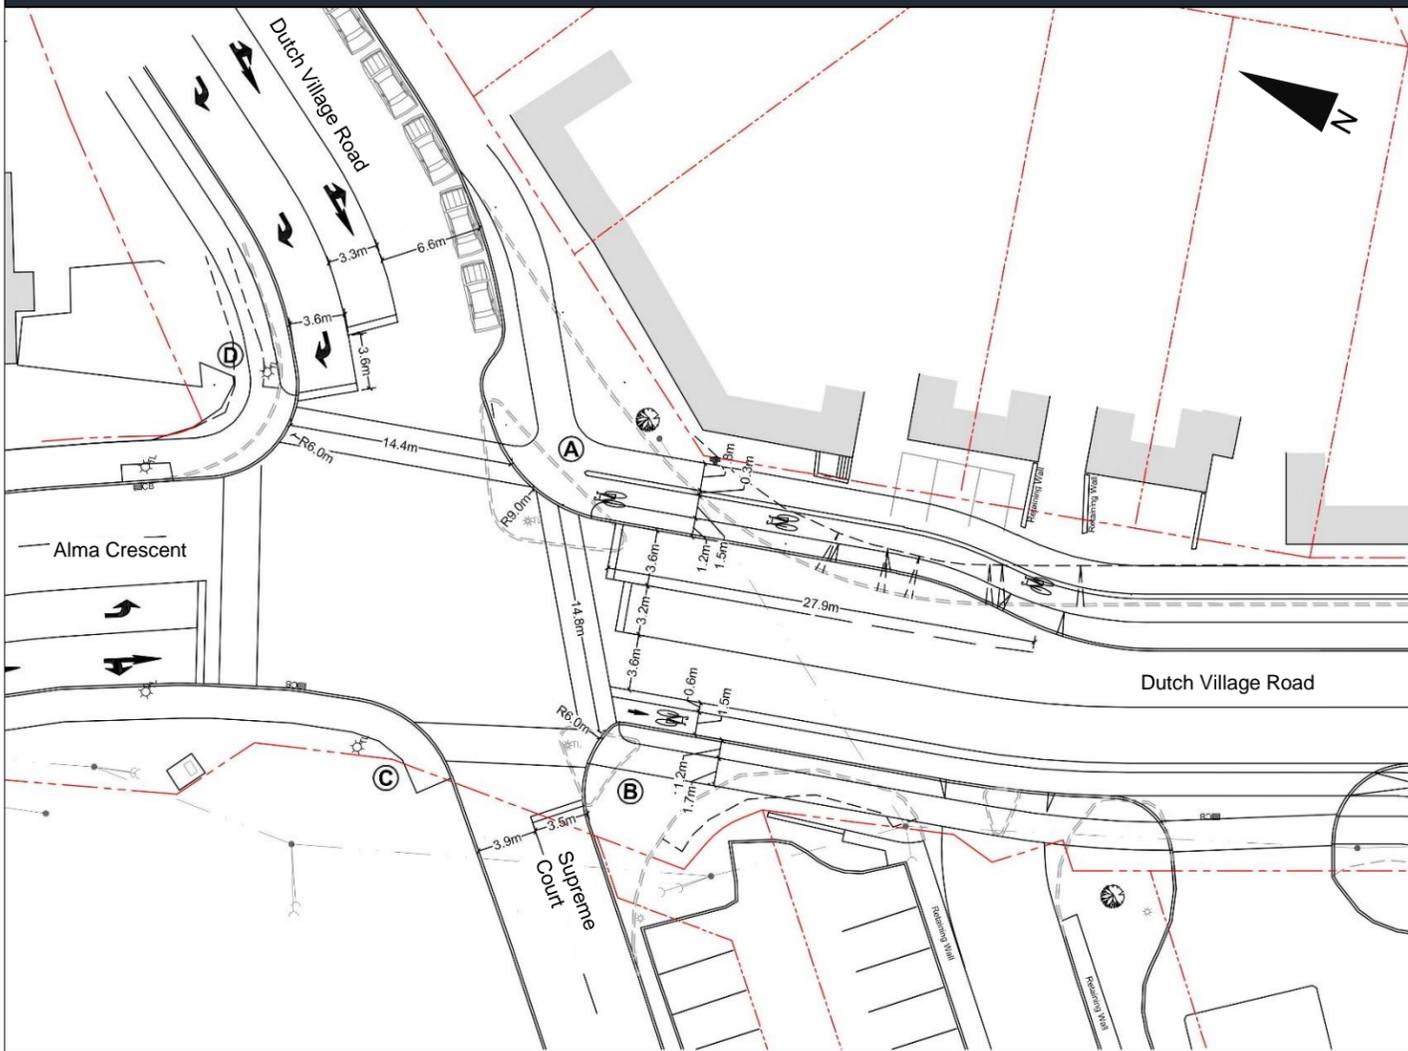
Proposed Intersection Configuration (Option 2B) – Dutch Village Road @ Alma Crescent / Supreme Court
